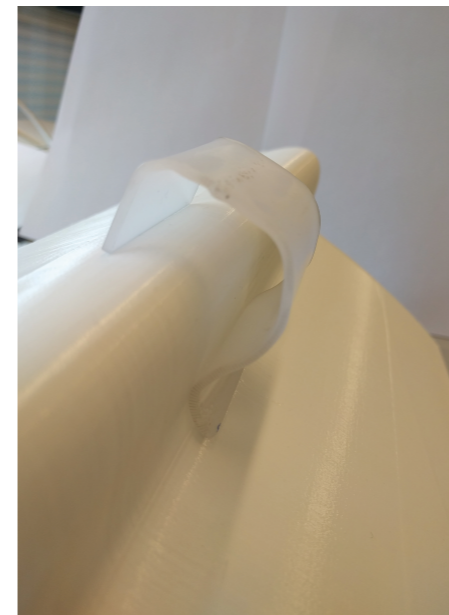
Cross section of the MX3D bridge it's handrail with the LED lighting installed.
